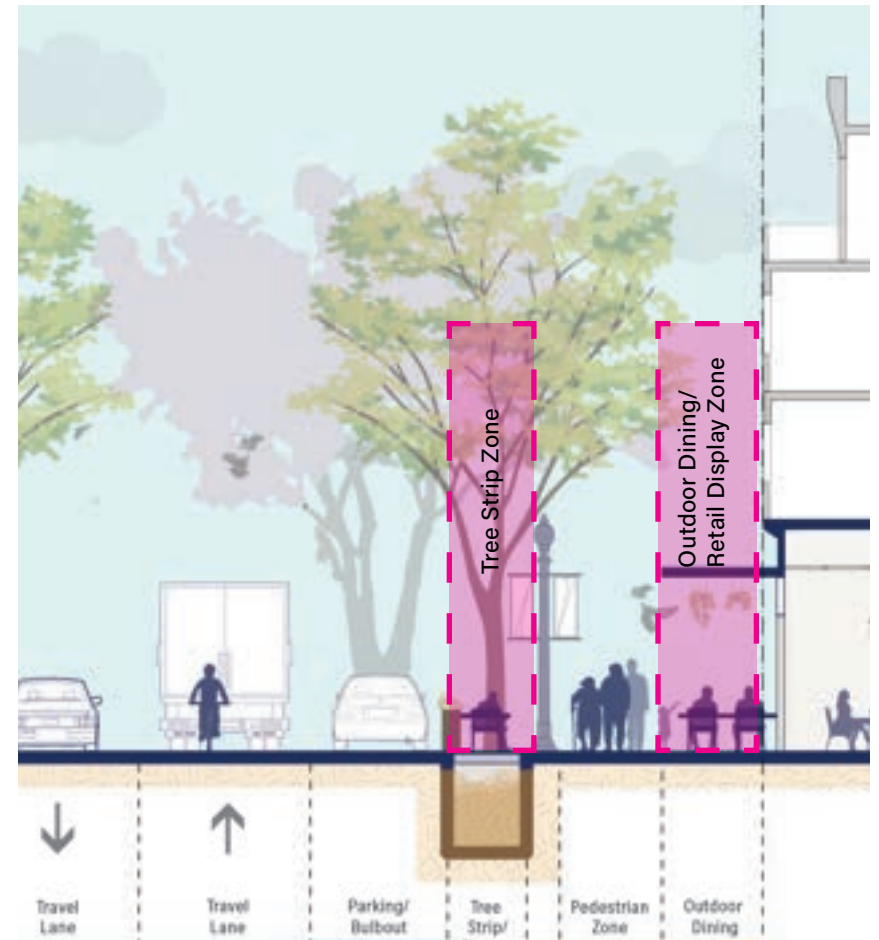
Tree Strip Zone and Outdoor Dining/ Retail Display Zone along 600 and 800 blocks of Laurel Street
